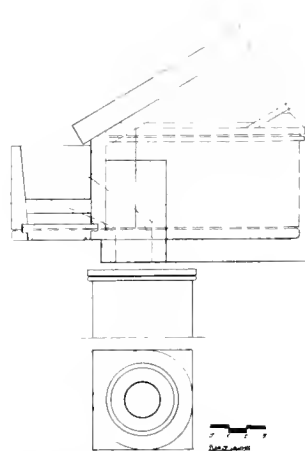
The box gutter applied to the front of the West Porch shed roof directs rain water toward the south end into a hollow, turned column which acts as a downspout. (Drawings surveyed and adapted from Okie prints)
